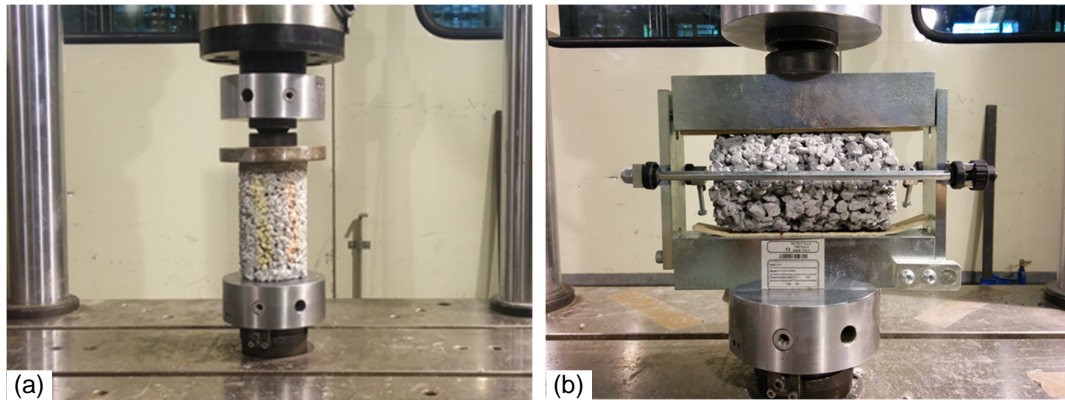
Compressive test assembly (a) and Brazilian test assembly (b).
